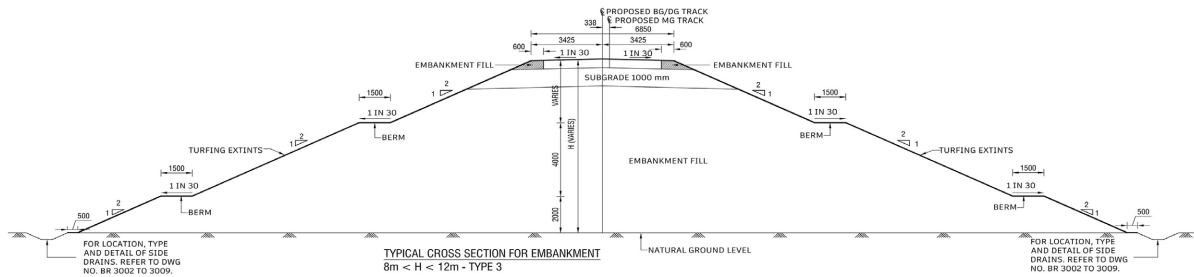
Typical cross section for embankment height 8 m to 12 m (Type 3).
